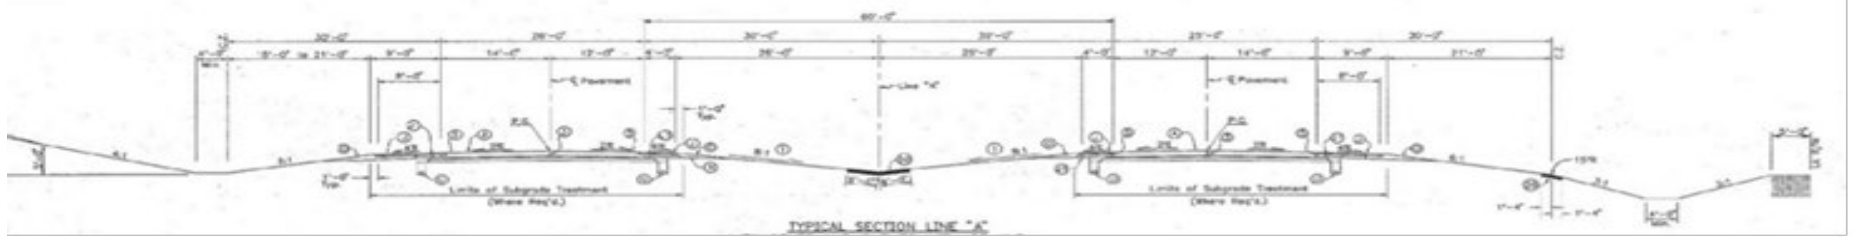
Typical Cross Section from Phase 1 plans, 2013 (R-26719)
